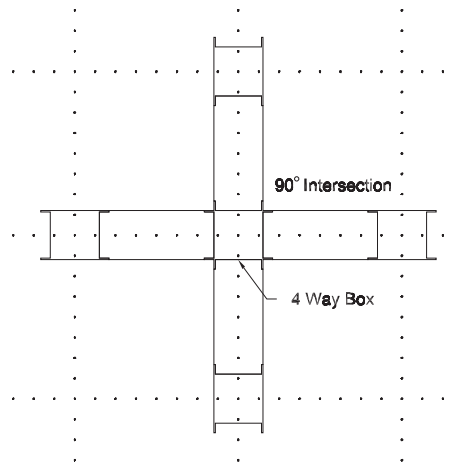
CF4 Wall with 90° Intersection using a 4-way Box
